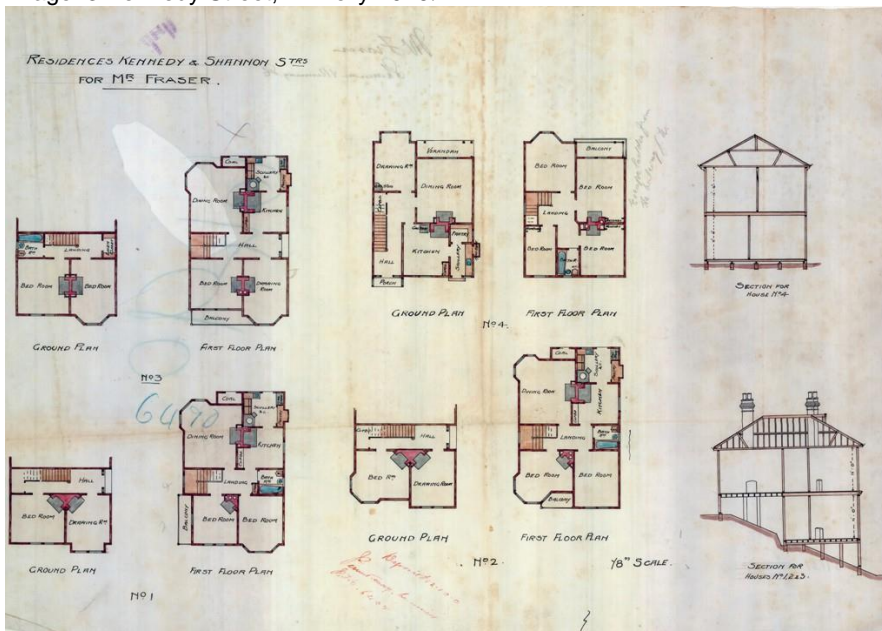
Image: The plans for 1, 3 Kennedy Street and 10, 12 Shannon Street. (6490; WCA)
